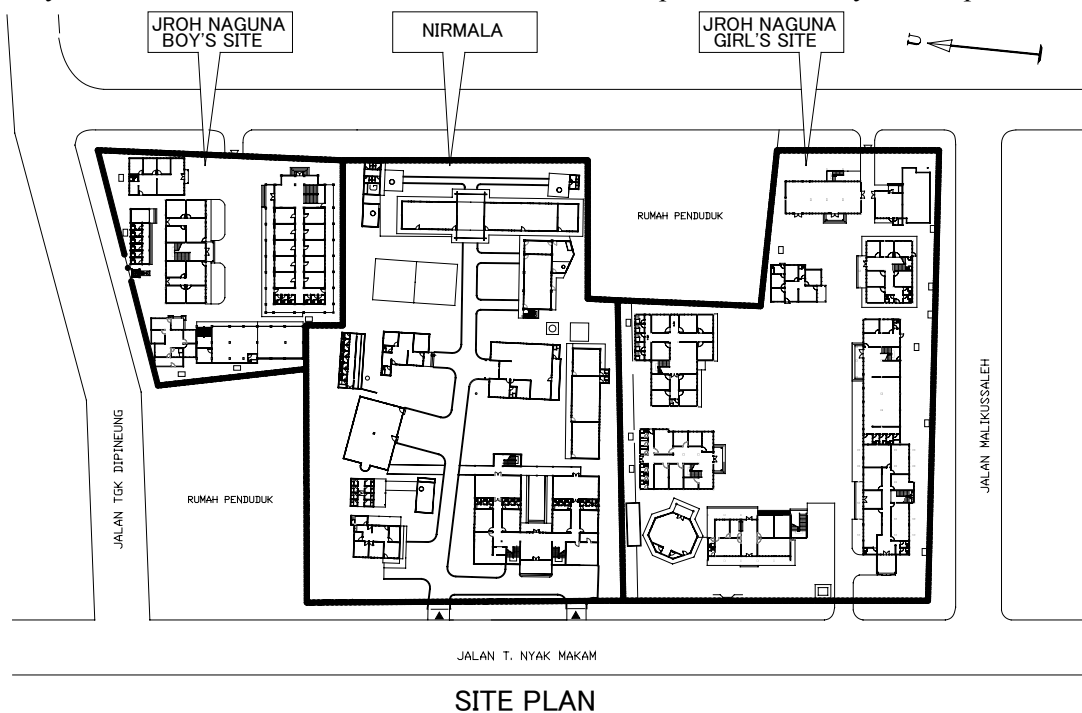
Site Plan of Jroh Naguna and Nirmala Orphanages
